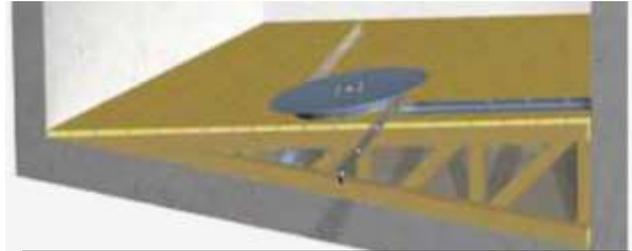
Showing an angled extract auger and false floor – the latter not installed on this project
